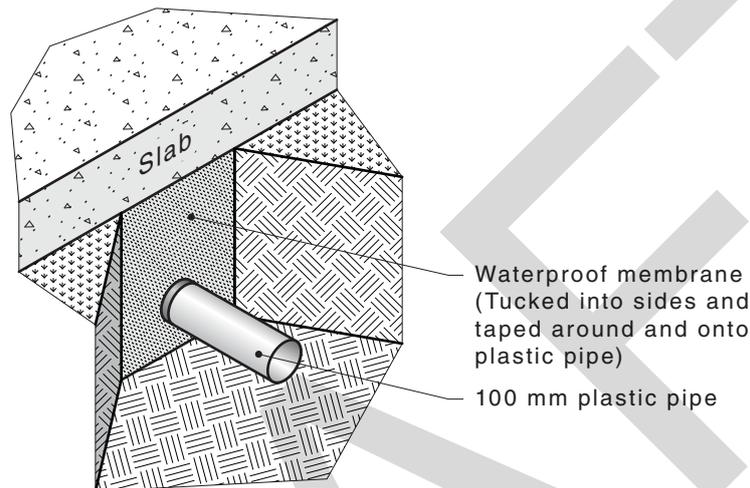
(B) TYPICAL INSTALLATION OF DAMP-PROOFING MEMBRANE
